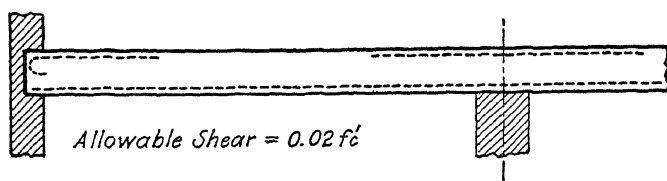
Typical Reinforced Concrete Beam; Principal Longitudinal Bars Without Special Anchorage.
